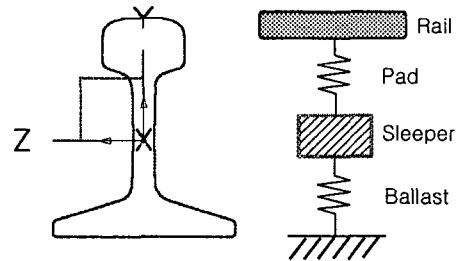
KS 60kg rail cross section and discrete rail support at sleeper
